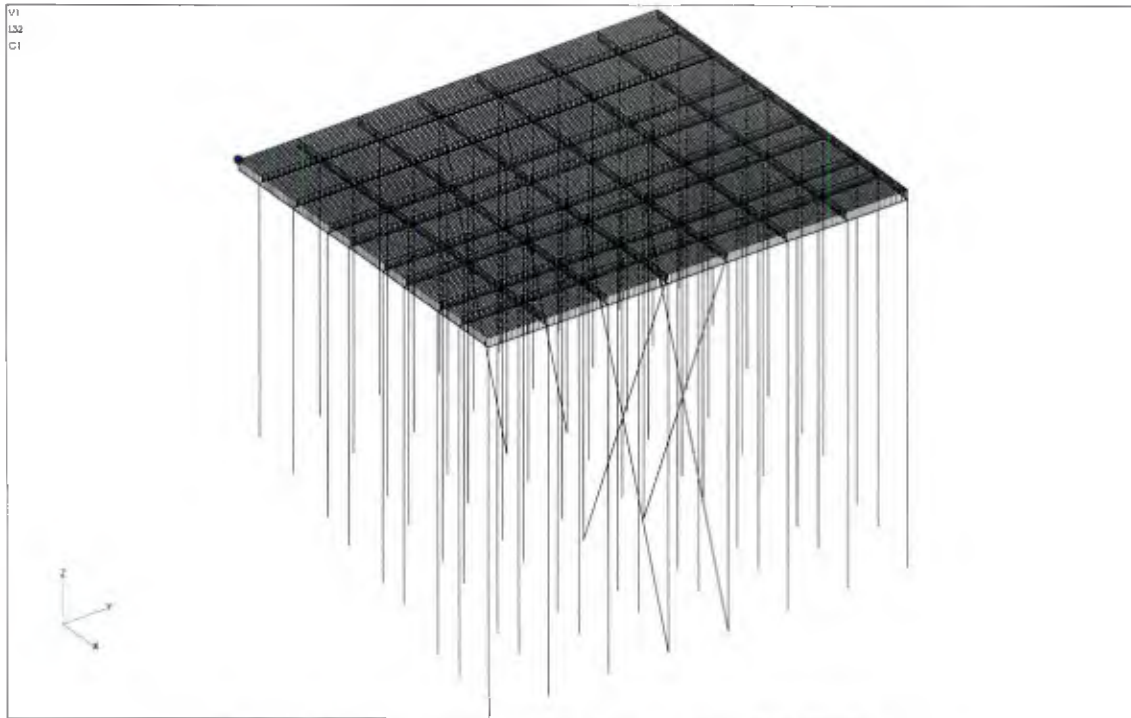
Detailed FEA model of Marginal Wharf main deck.
